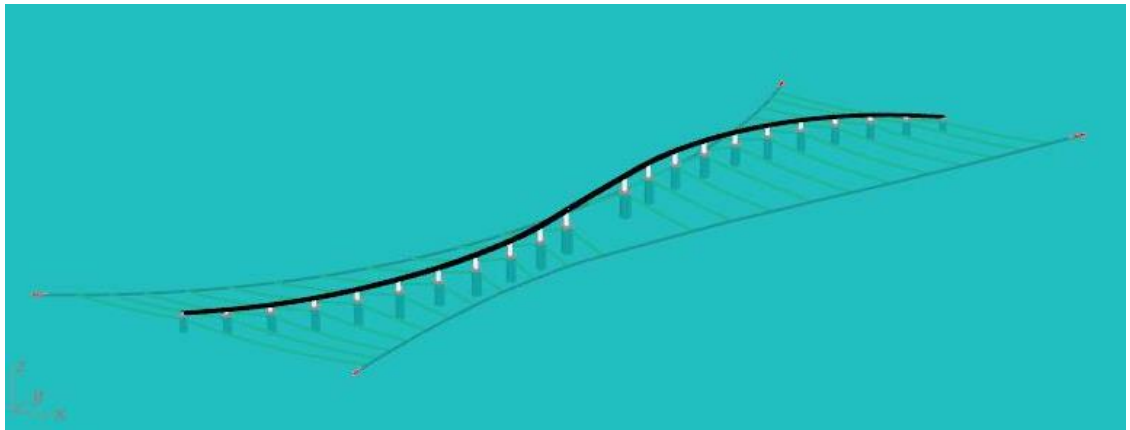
SUBMERGED ANCHORING SYSTEM
